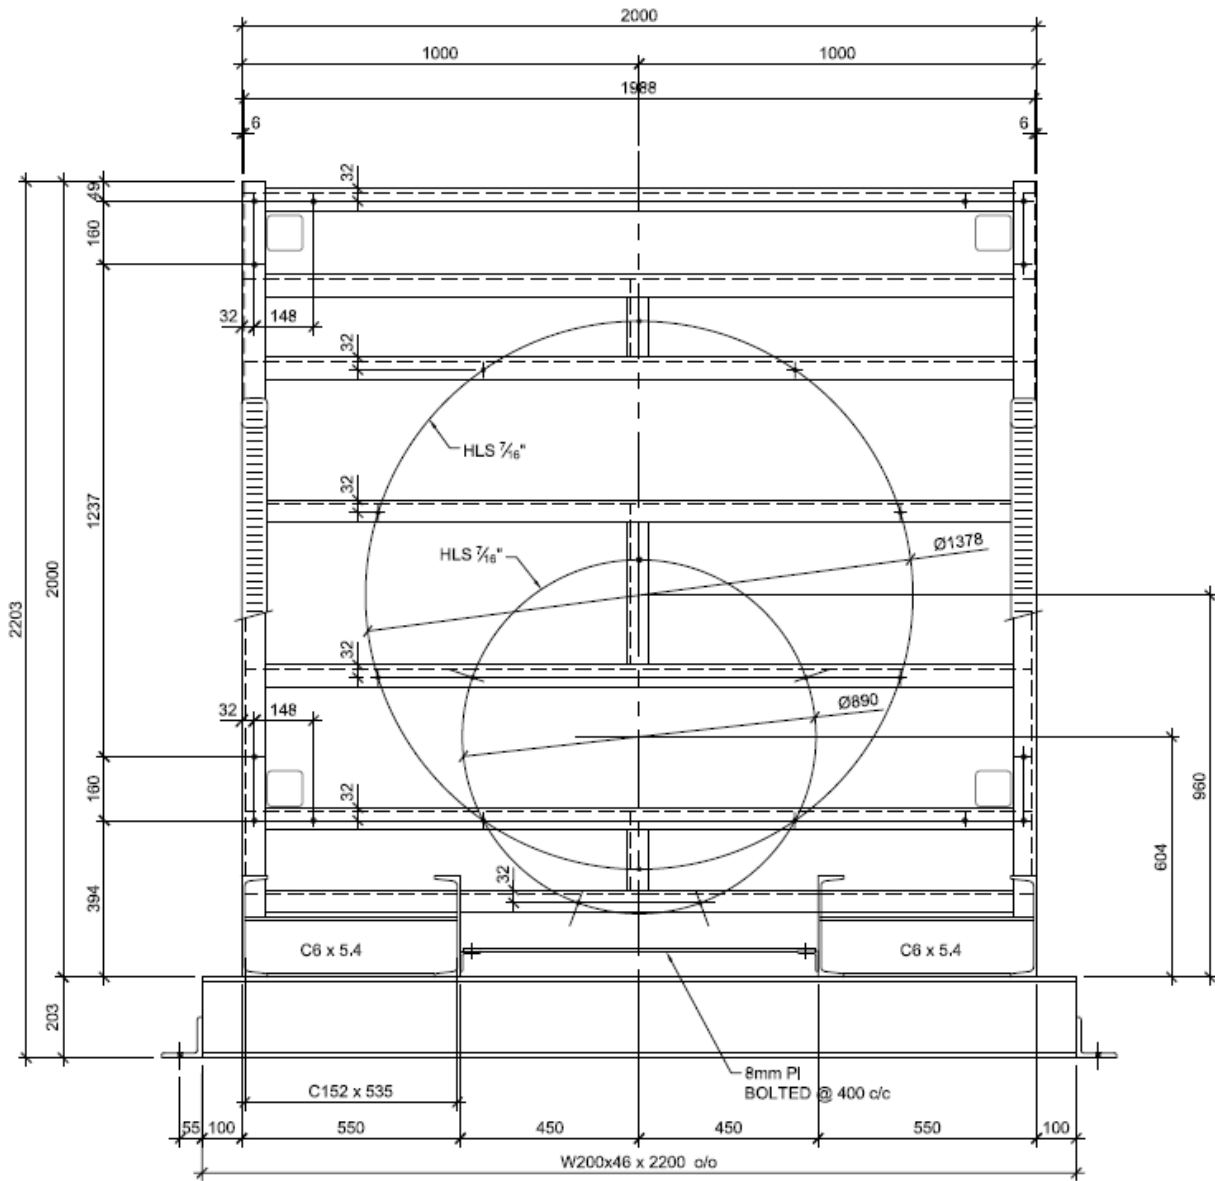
Plan view of the half of the loading frame anchored to the test floor; the other half is similar, but without steel supports anchoring the frame to the floor.
